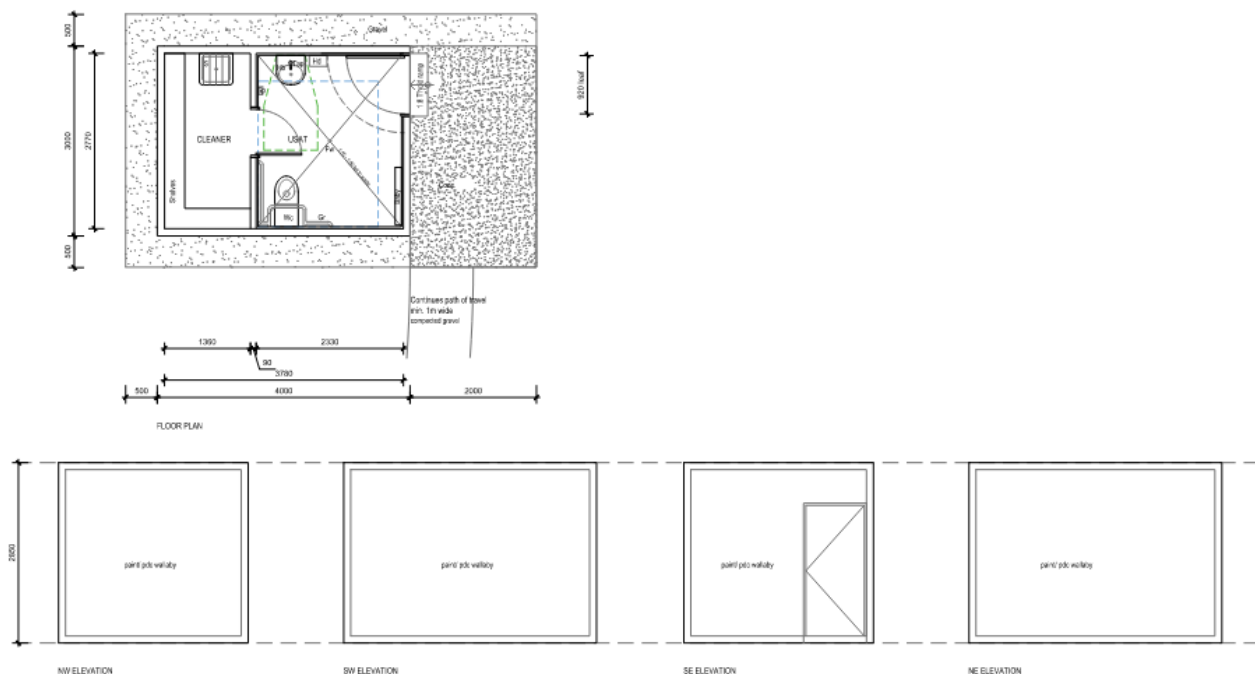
Excerpt of the floor plan and elevation plan (Source: Application Documents).
